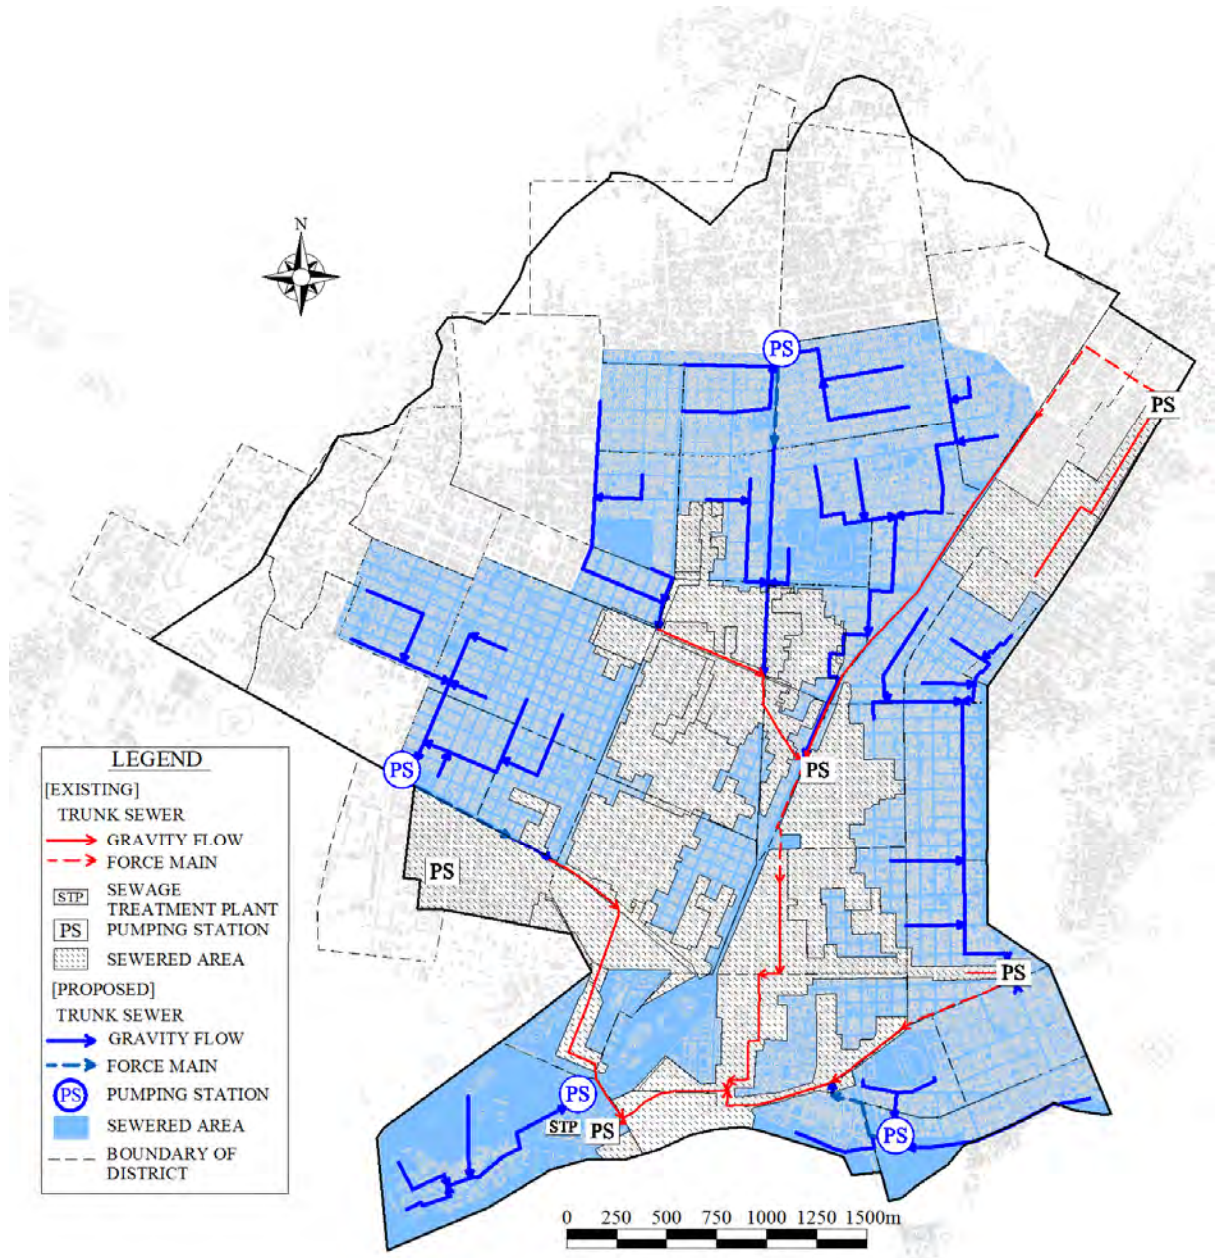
Layout Plan of Alternative 2 (Sewer Network)
